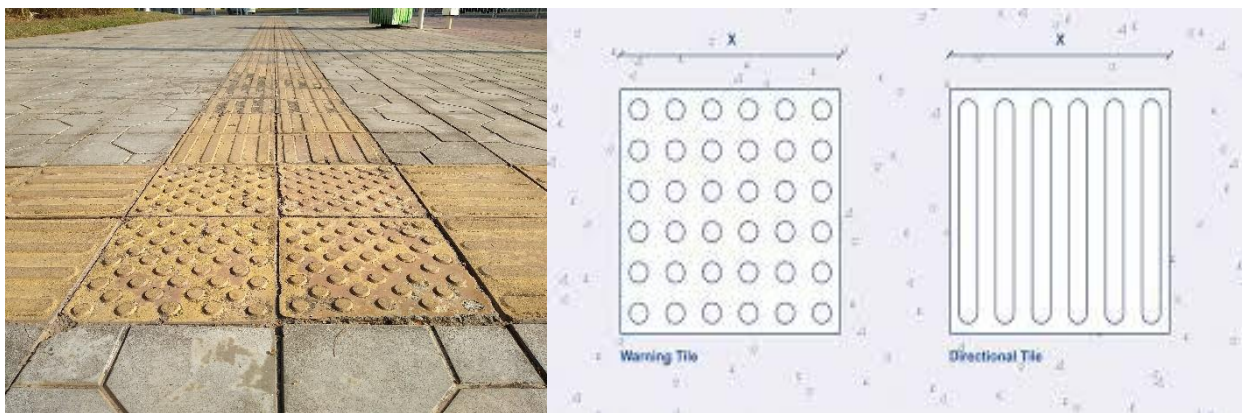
Warning tile and directional tile of tactile pavement (Source: Global street design Guide, 2016)
